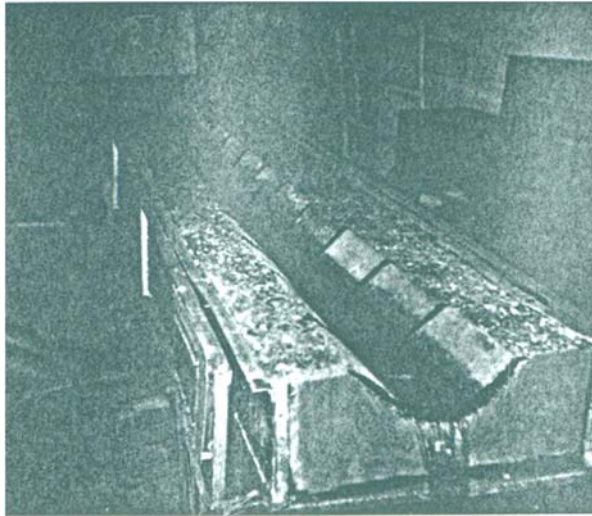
Laboratory filtration tray faced with concrete slabs 50x20x3cm with expansion joint based on PBR.
